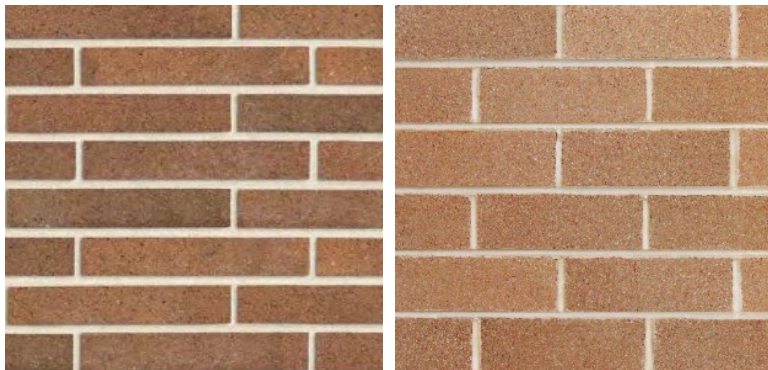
previously proposed brickwork (left) – proposed brickwork (right)
